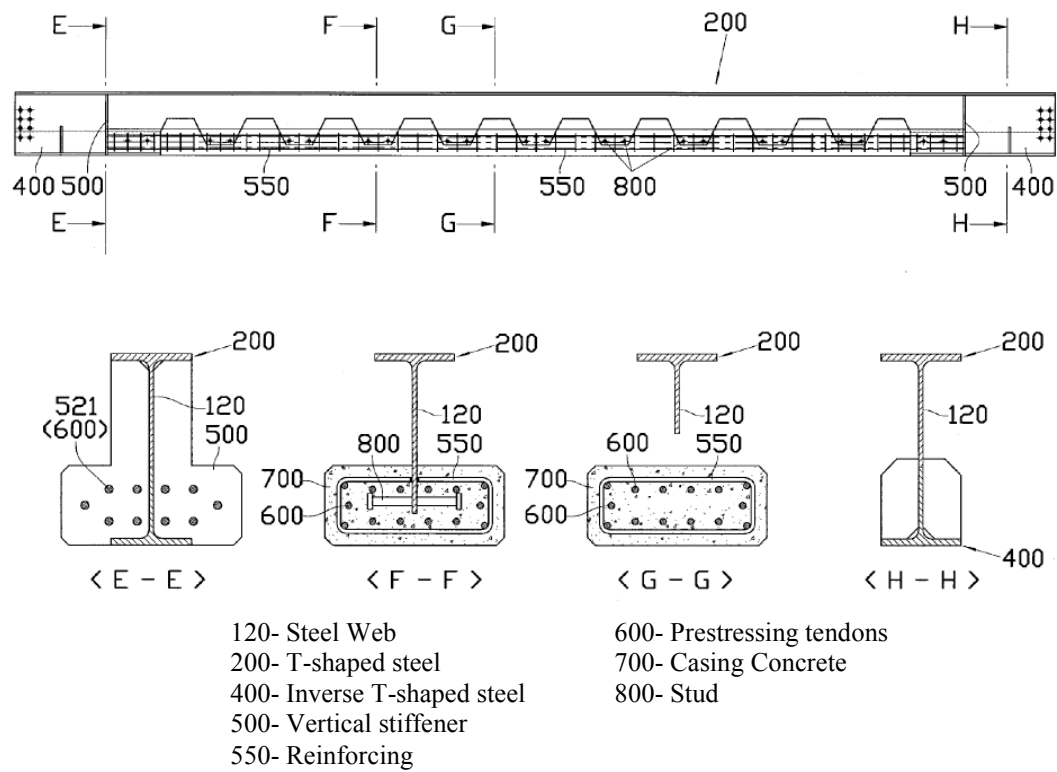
Composite Beam with T-Steel (Kim, 2011)
